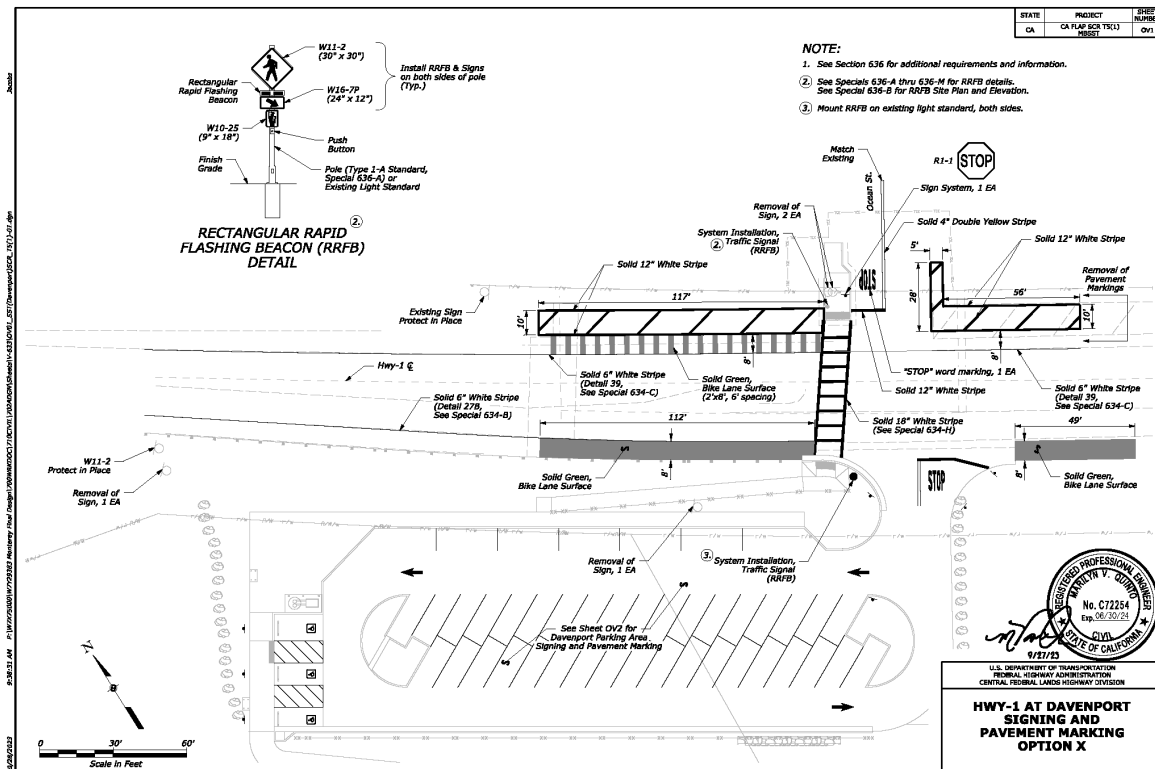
Davenport Beach Parking Area Reconfiguration Plan
